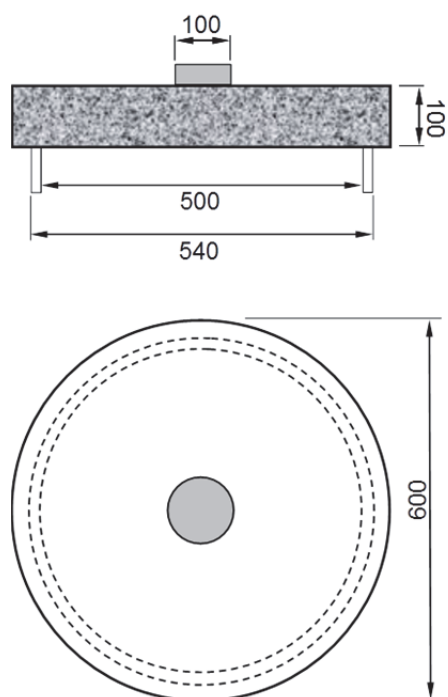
Round panel tests: Dimensions (mm). The steel supporting ring is the dashed line. Ref. NB 7: 2011
